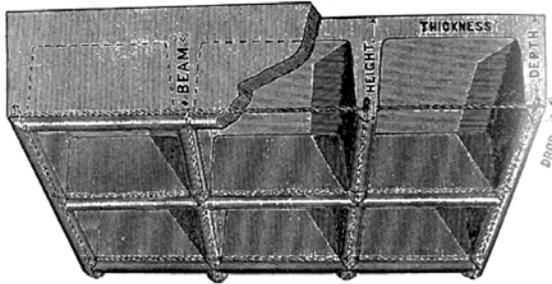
Ribbed floor construction system, commonly known today as the waffle slab, Ransome, 1889. (Sutherland)
